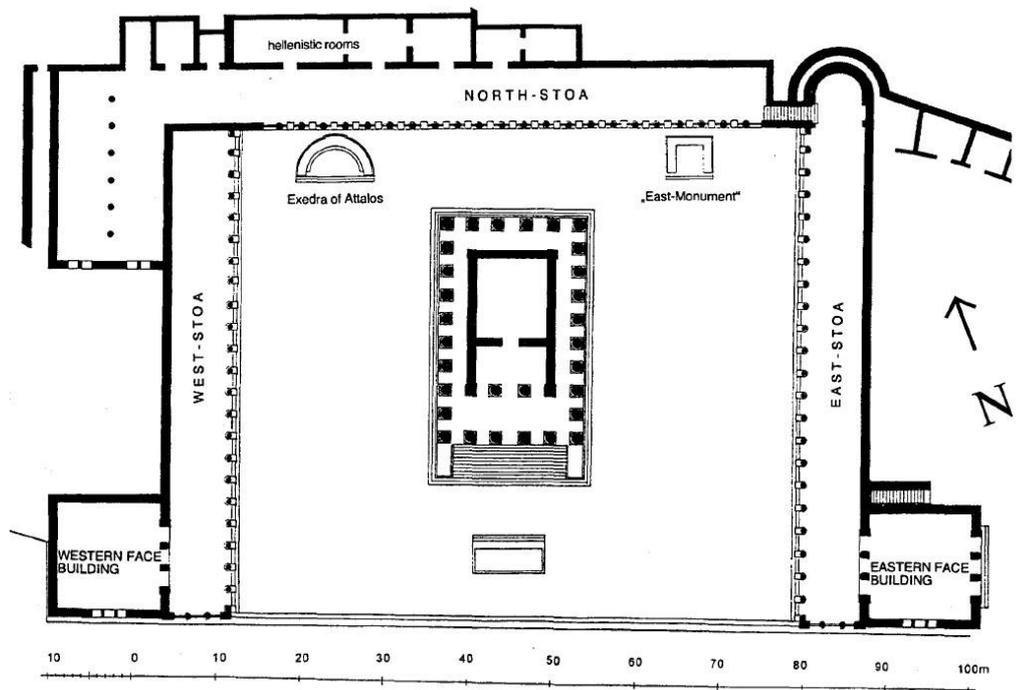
Restitution plan of the Trajaneum. (Source: Nohlen, 1999)
